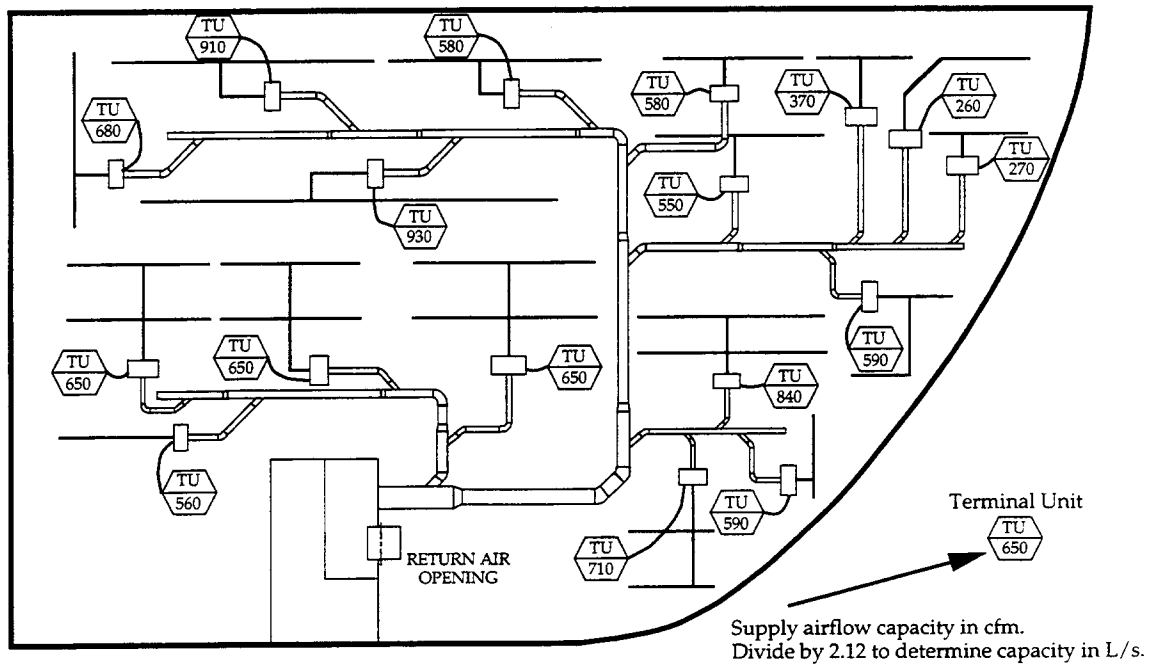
Example of Mechanical Drawing - Floor Plan
